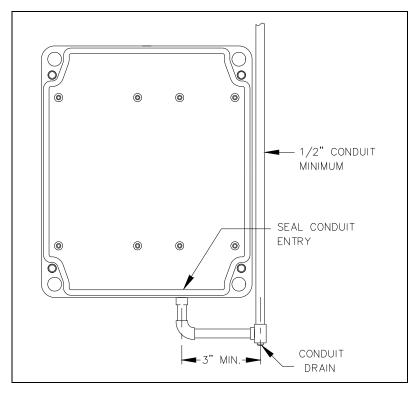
Model 246-700 & 256-700 - Bottom entry conduit installation details
